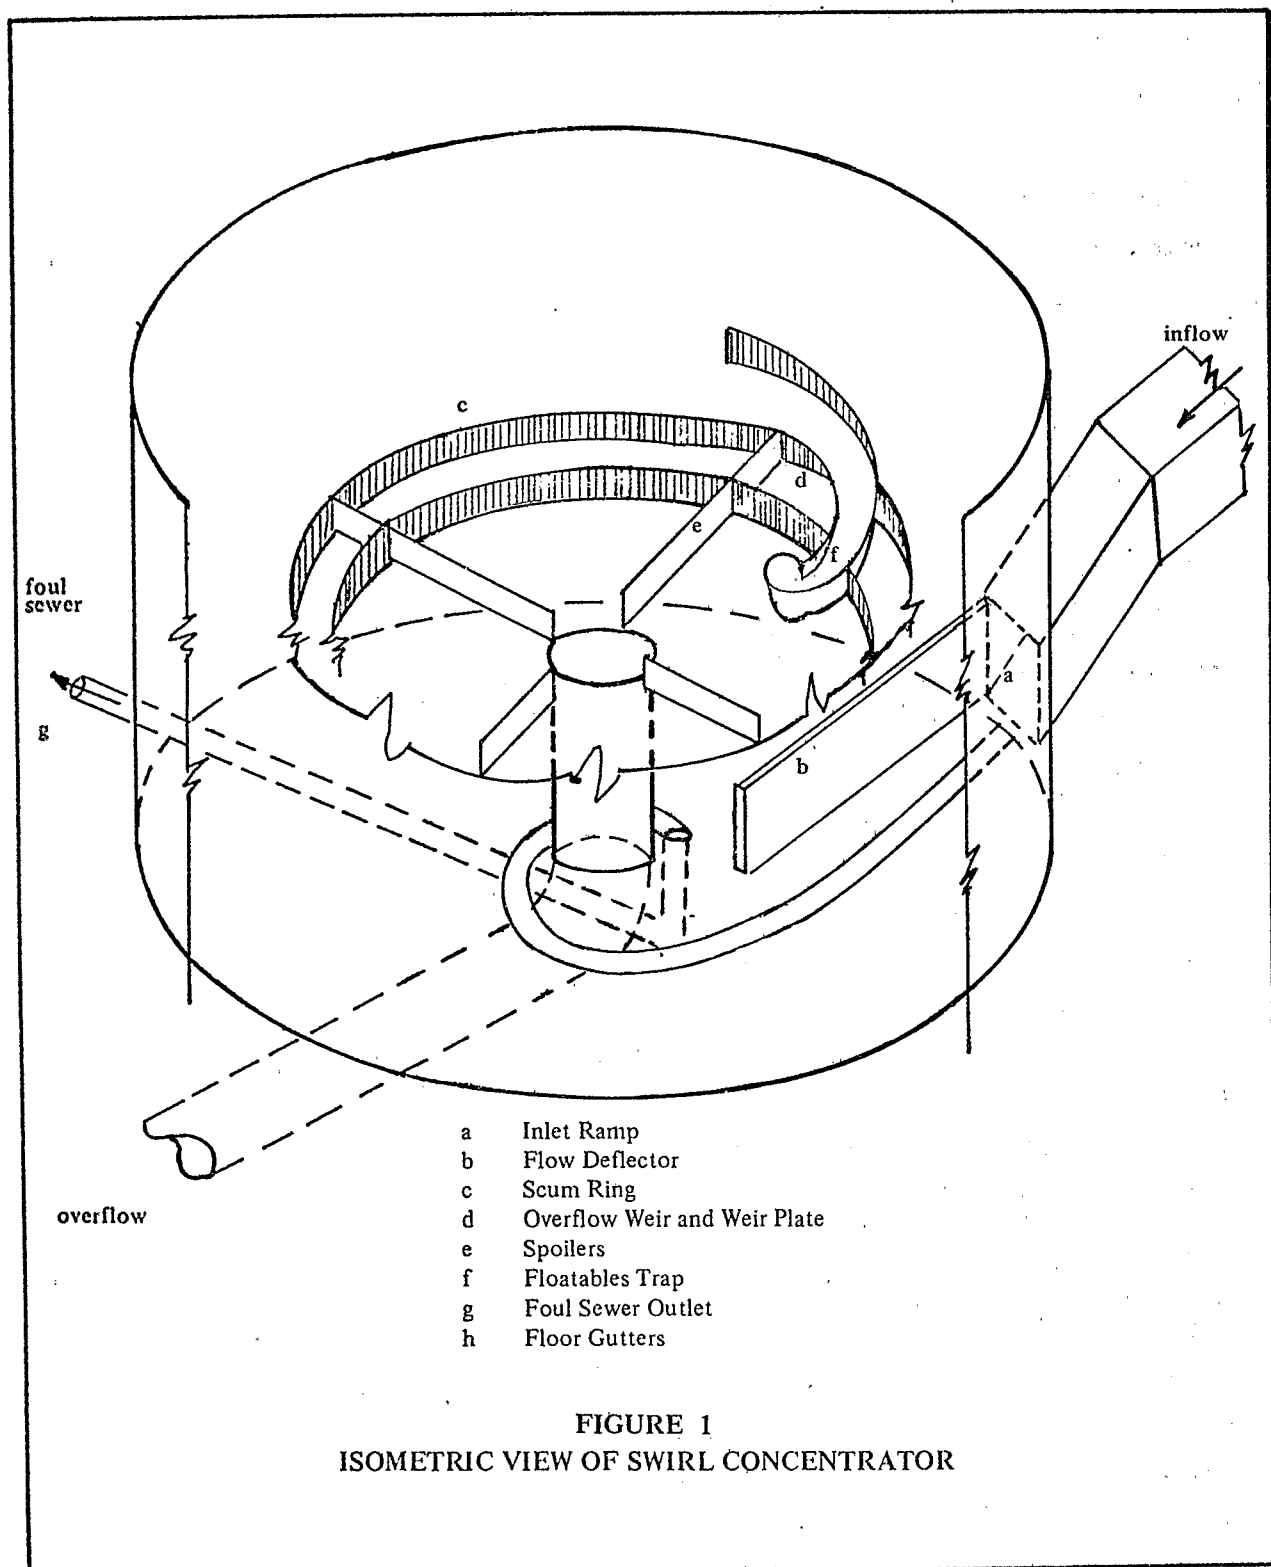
, Isometric View of Swirl Concentrator, depicts the final hydraulic model layout showing details such as the floatables trap, foul outlet and floor gutters.
